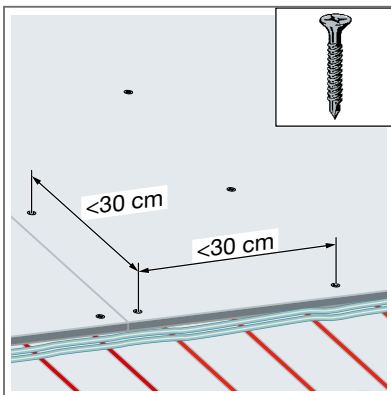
Use drywall screws to fasten the gypsum fibre construction panels
